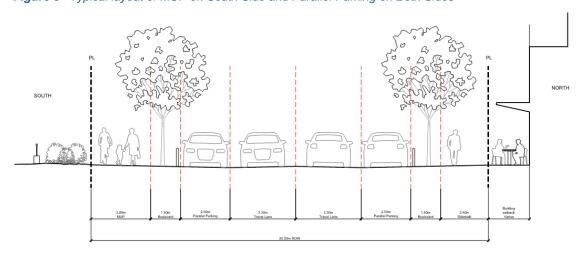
Cross-Section with MUP on South Side and Parallel Parking on Both Sides
